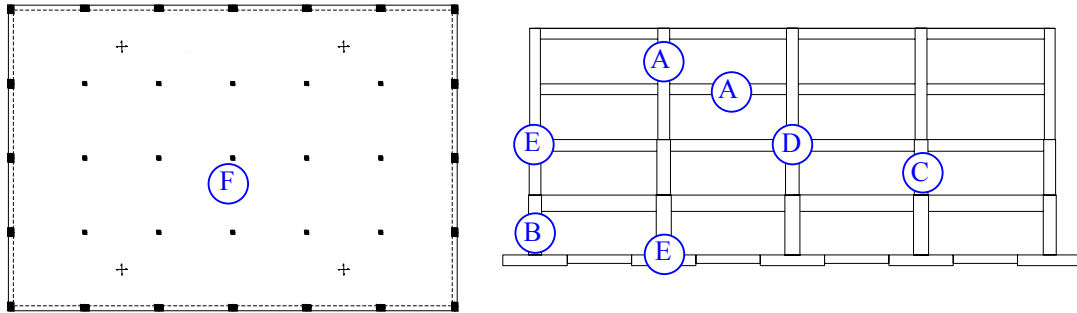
Reinforced concrete frame building plan and elevation views, show possible deterioration modes (after Deierlein et al. 2005).
